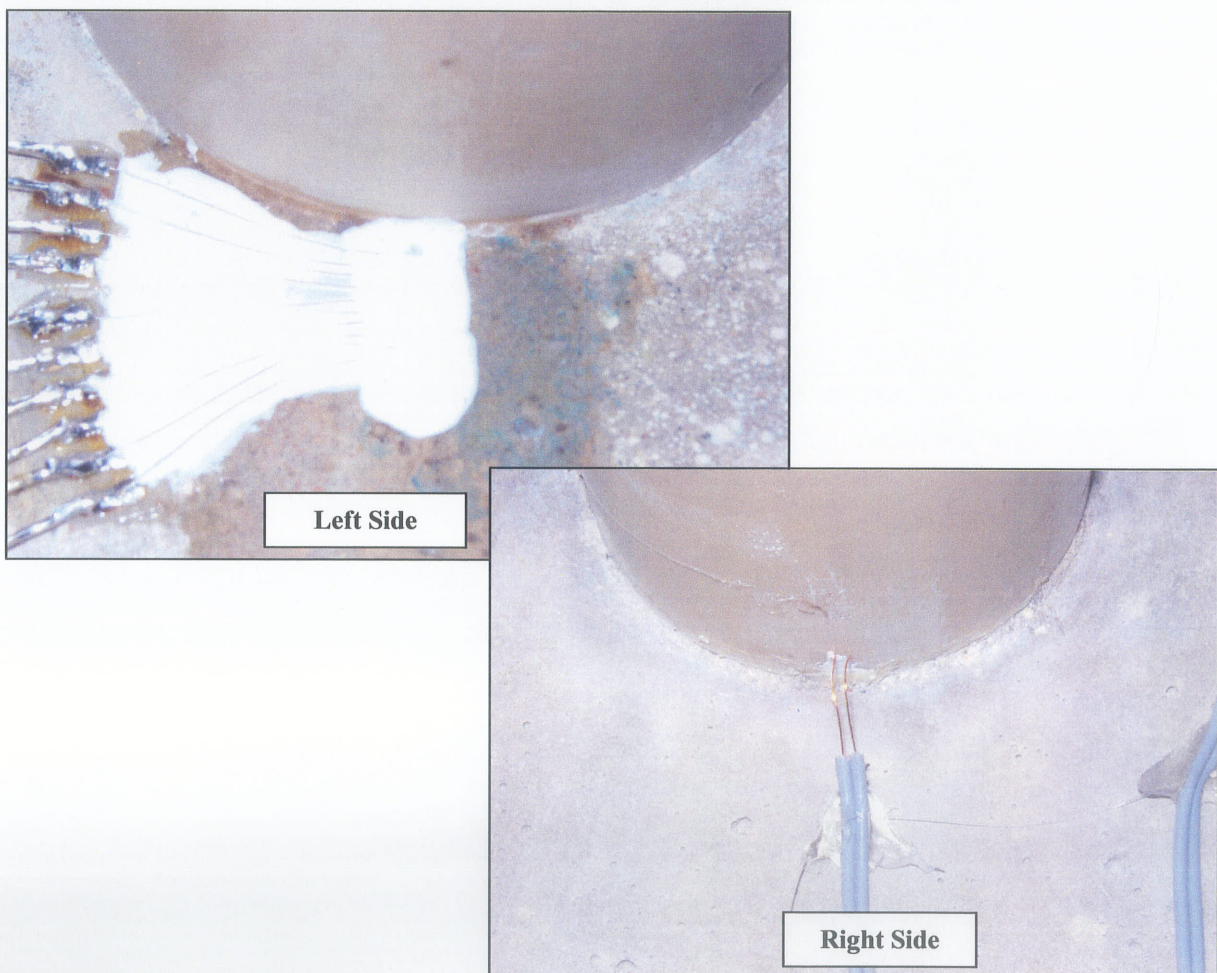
(b): Concrete below 63.5-mm concrete-filled GFRP dowel after failure (80 kN) – Phase II -- No visible damage to concrete
